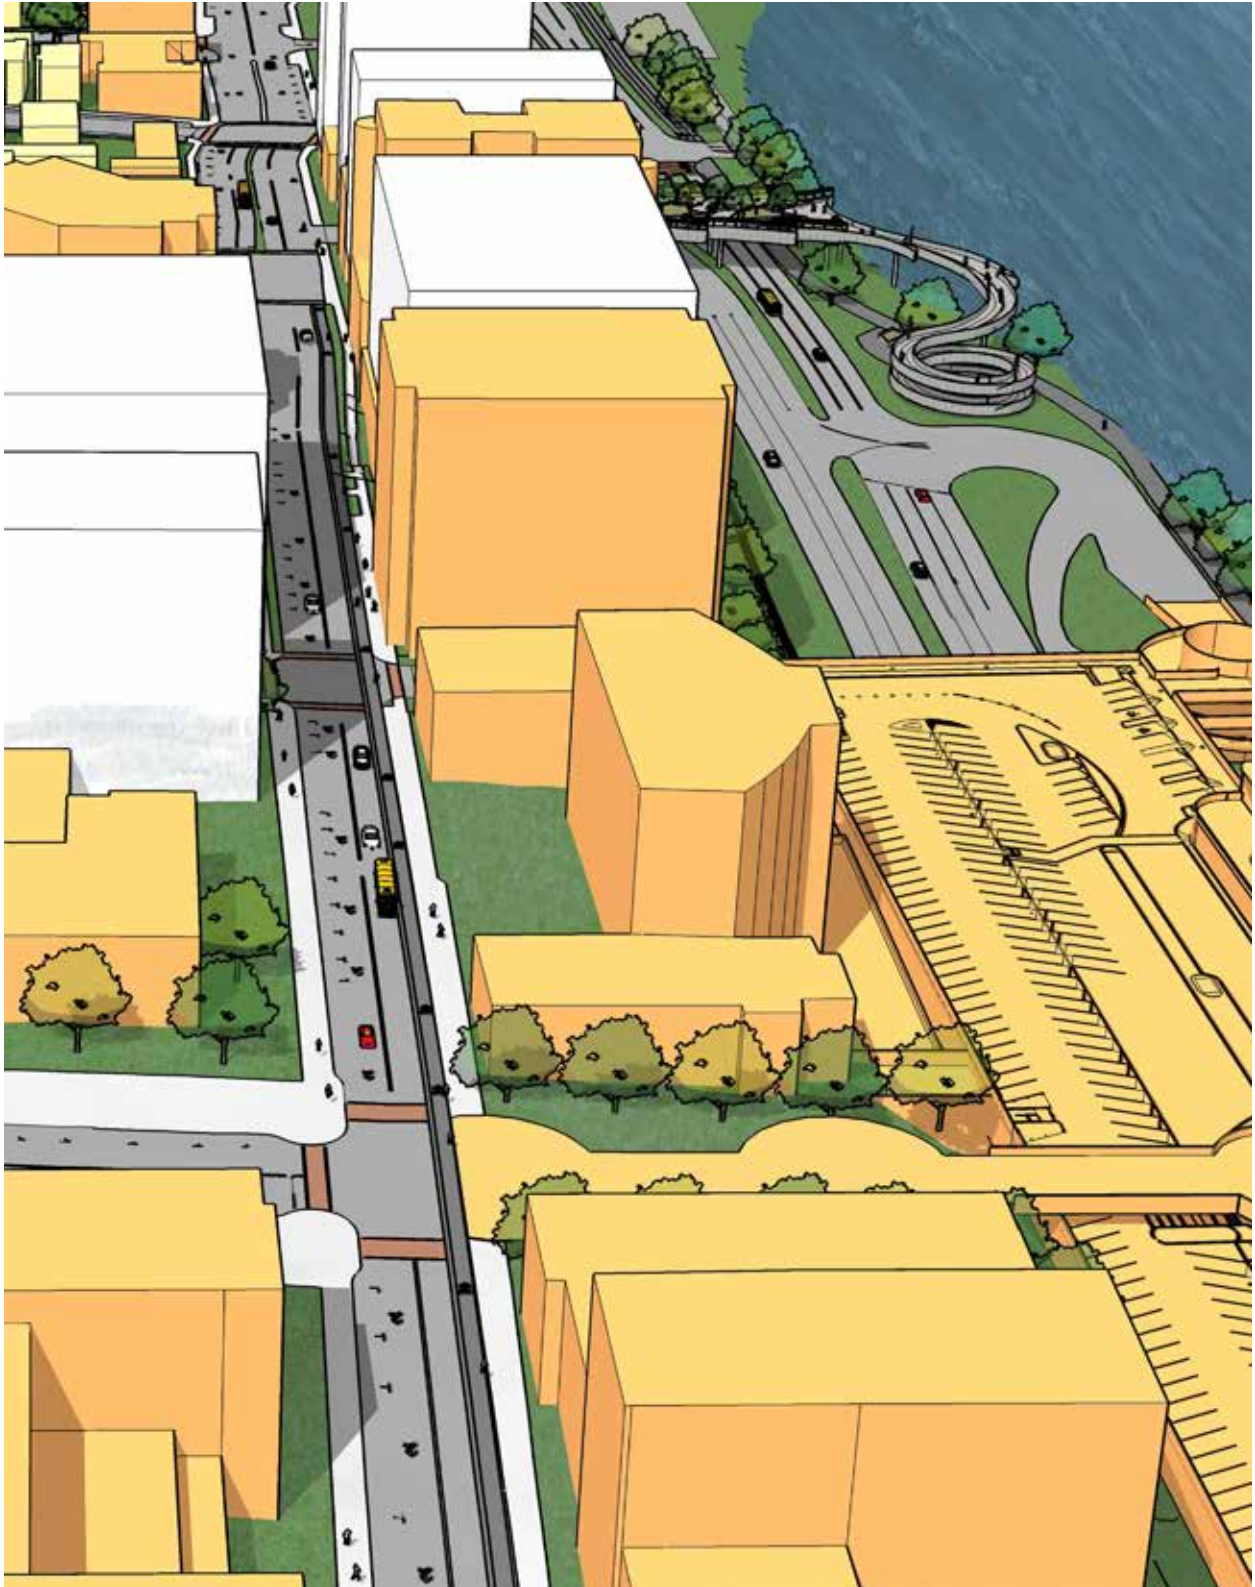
Wilson Street Context Plan from Broom Street Intersection
